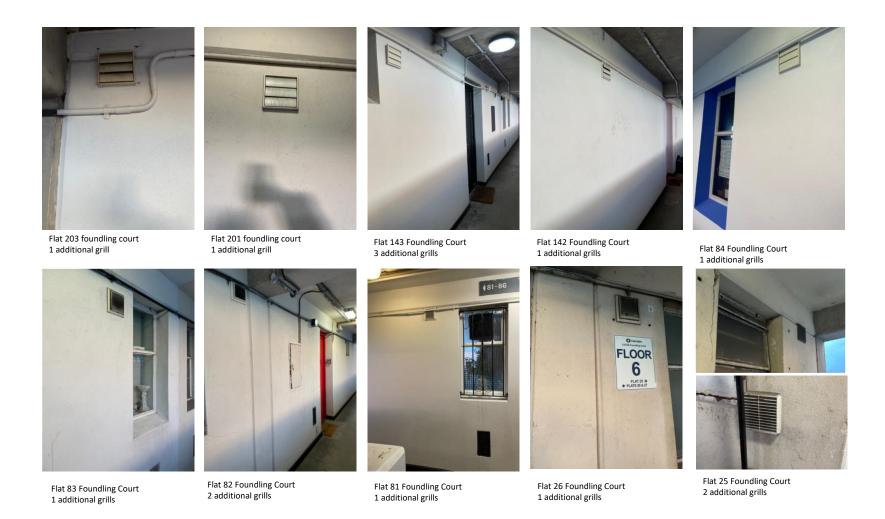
Documenting all flats on 6th floor of foundling court (where 139 foundling court is situated), which have installed additional external grills for ventilation, and how many additional grills are installed per flat. 10 out of 22 flats on the 6th floor have installed additional grills through the block build aspect of the external wall, for extraction for the bathroom and/or kitchen
